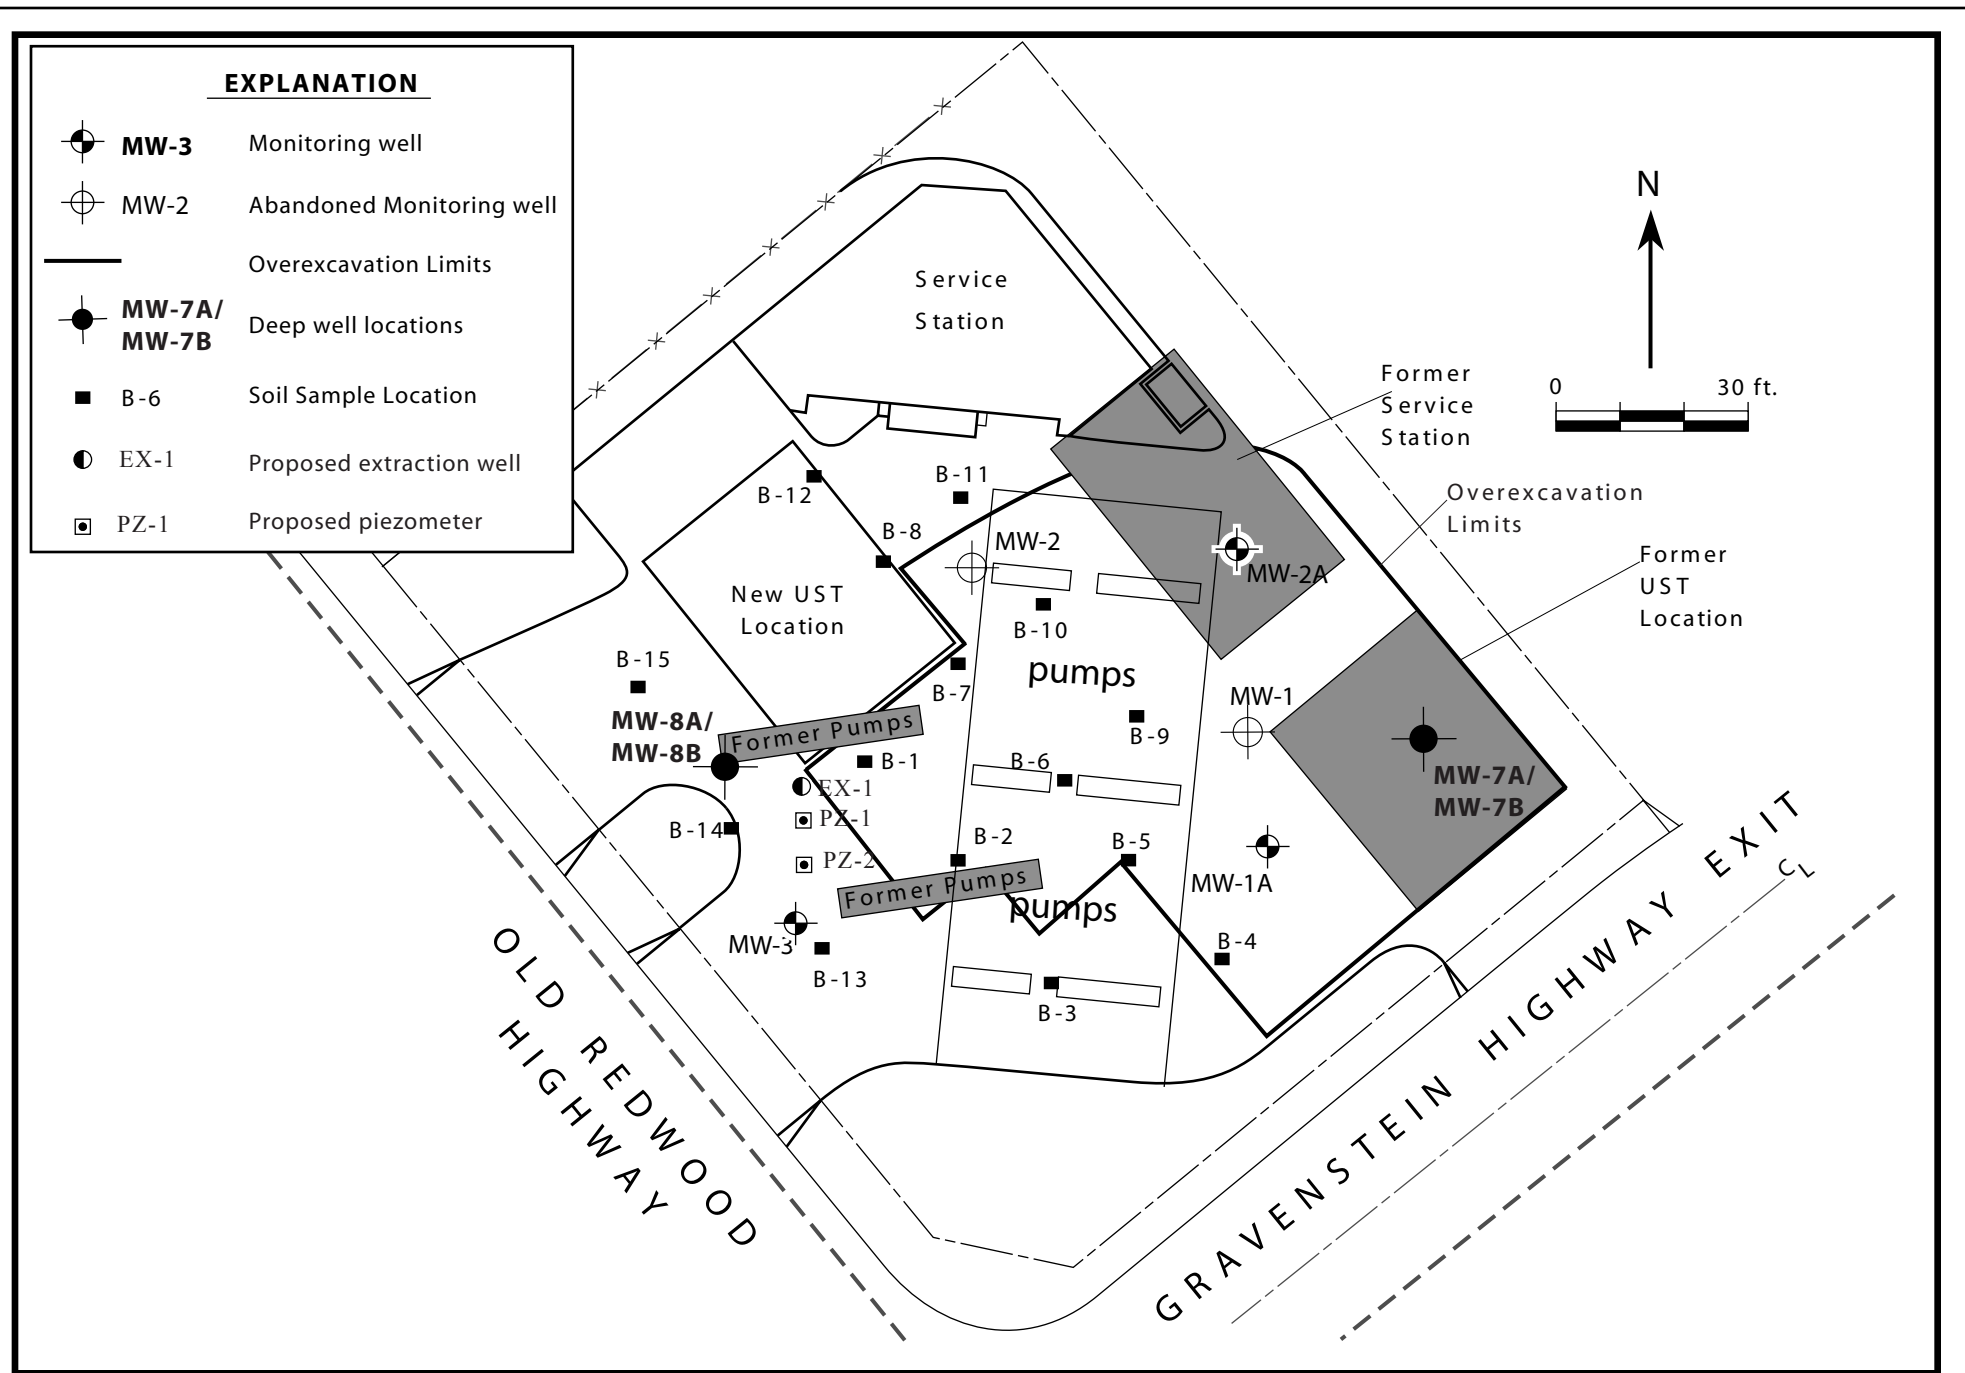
Site Plan and Proposed Locations for Extraction Well/Piezometers – Redwood Oil Service Station #102, 7716 Old Redwood, Cotati, California
